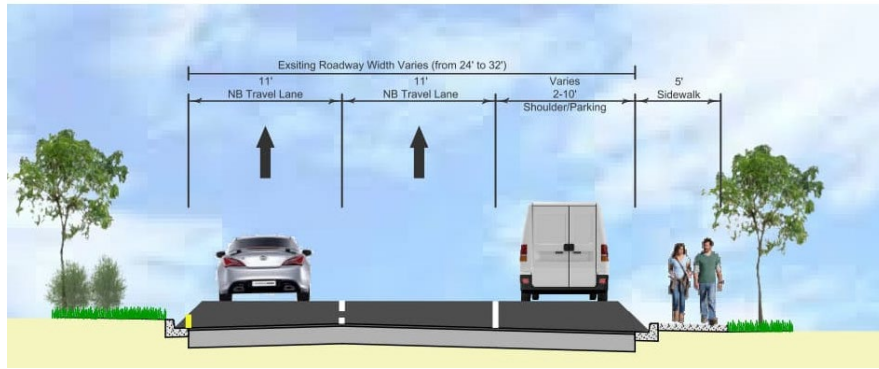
Existing Typical Section MD 272 (Mauldin Ave) Russell Street to Irishtown Road
